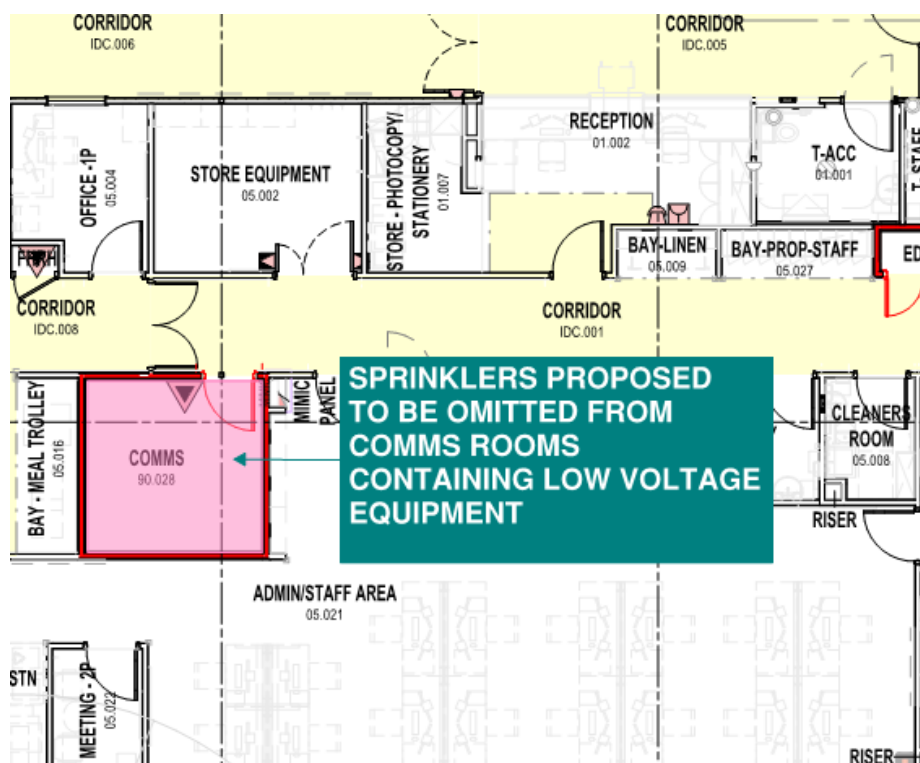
Comms Room containing low voltage equipment on Level 02 proposed to have sprinklers omitted from the room
